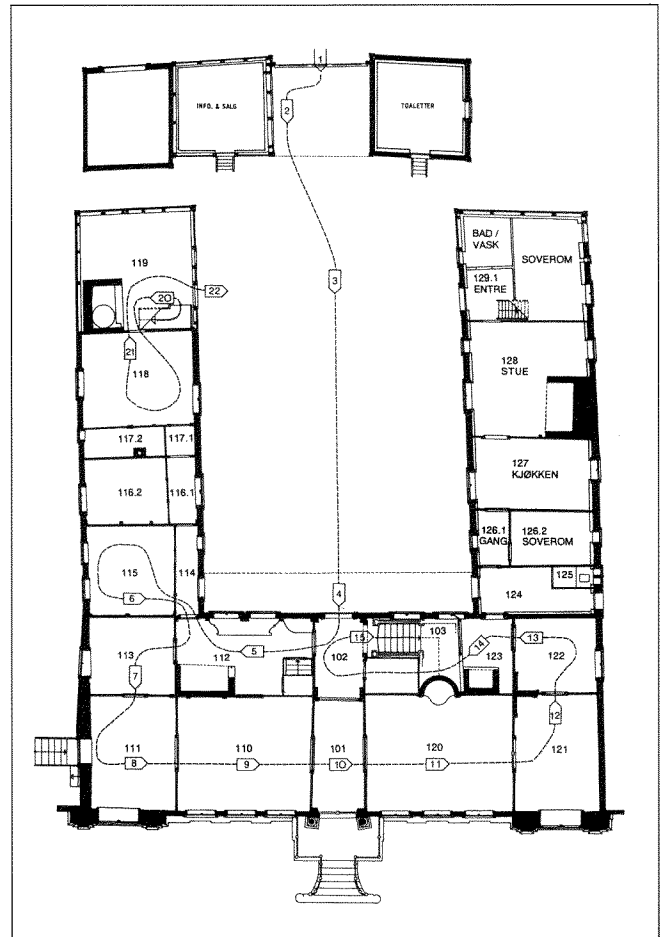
Plan. Ground floor. The main part comprises the museum. Rooms 124–129, in the west wing, built within the existing building, are an apartment for the keeper/gardener. The attic is used as the museum's storage room and for temporary exhibitions. Room 116.2 is a small kitchen and room 118, a cafe. The direction of the guided tours is marked on the plan. Photo: Arkitektene Hansteen A/S.
